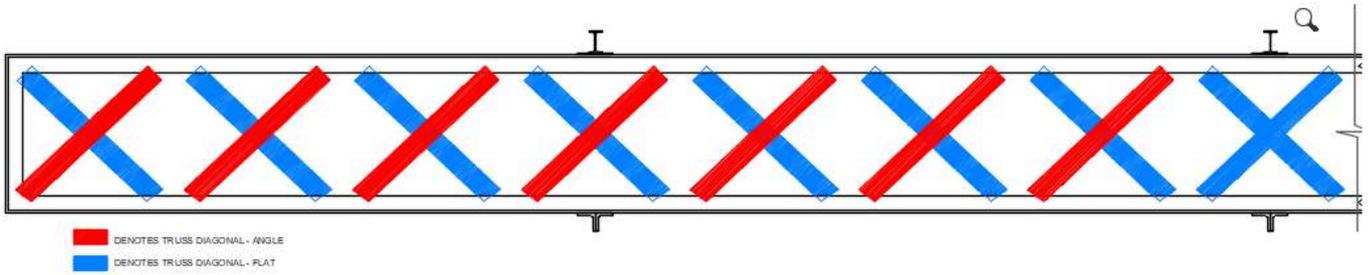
Part elevation on frame indicating the internal elements (Frame mirrors about centerline of truss).
